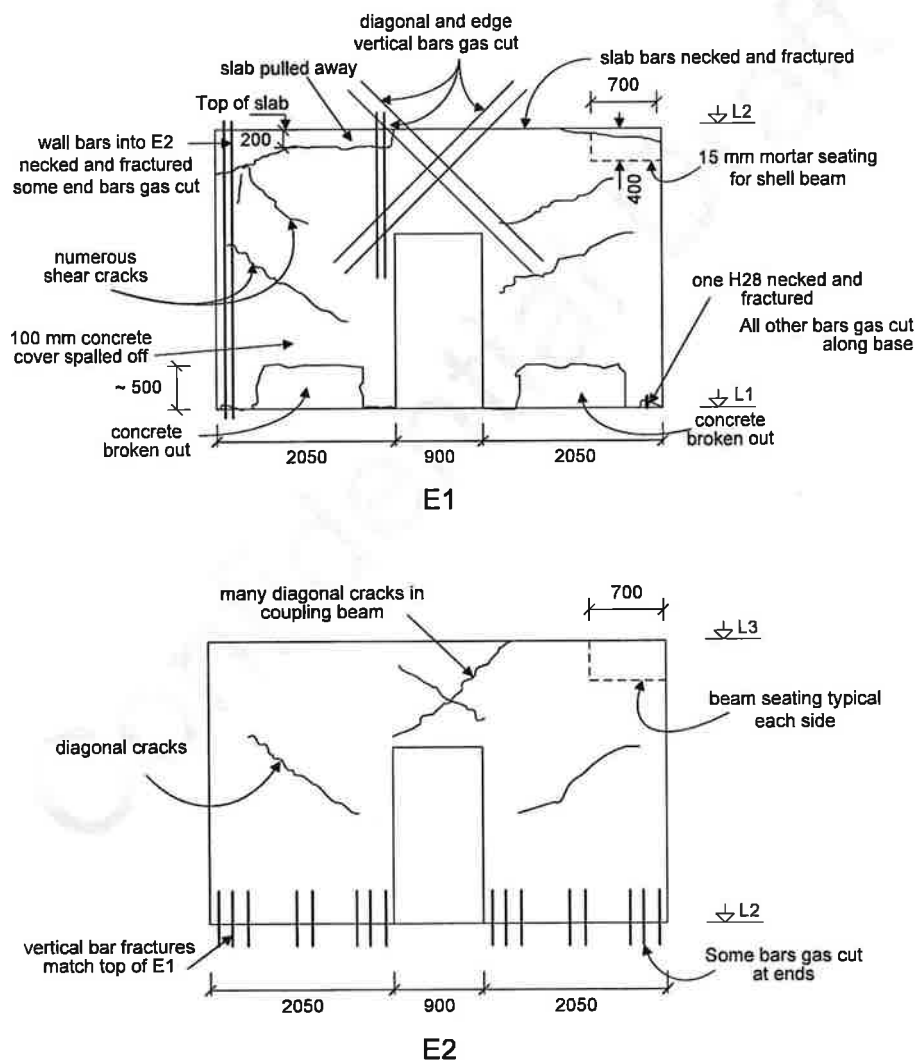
Line 1 South Wall remnants (top) E1 Level 1 to 2; (Bot) E2 Level 2 to 3.
